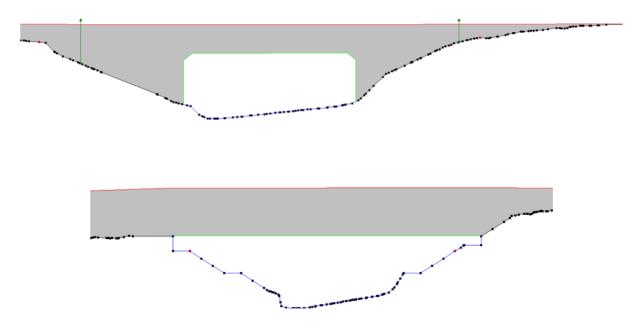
Existing box culvert bridge design compared to proposed clear-span bridge
